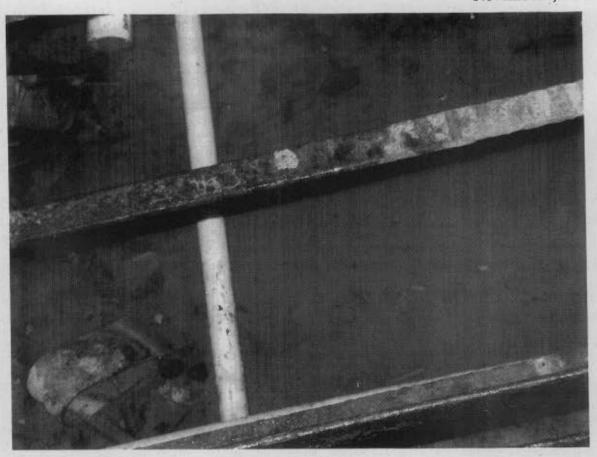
Another view of plating area floor with epoxy coating, near tanks 61-65 on the east side of the plating area
